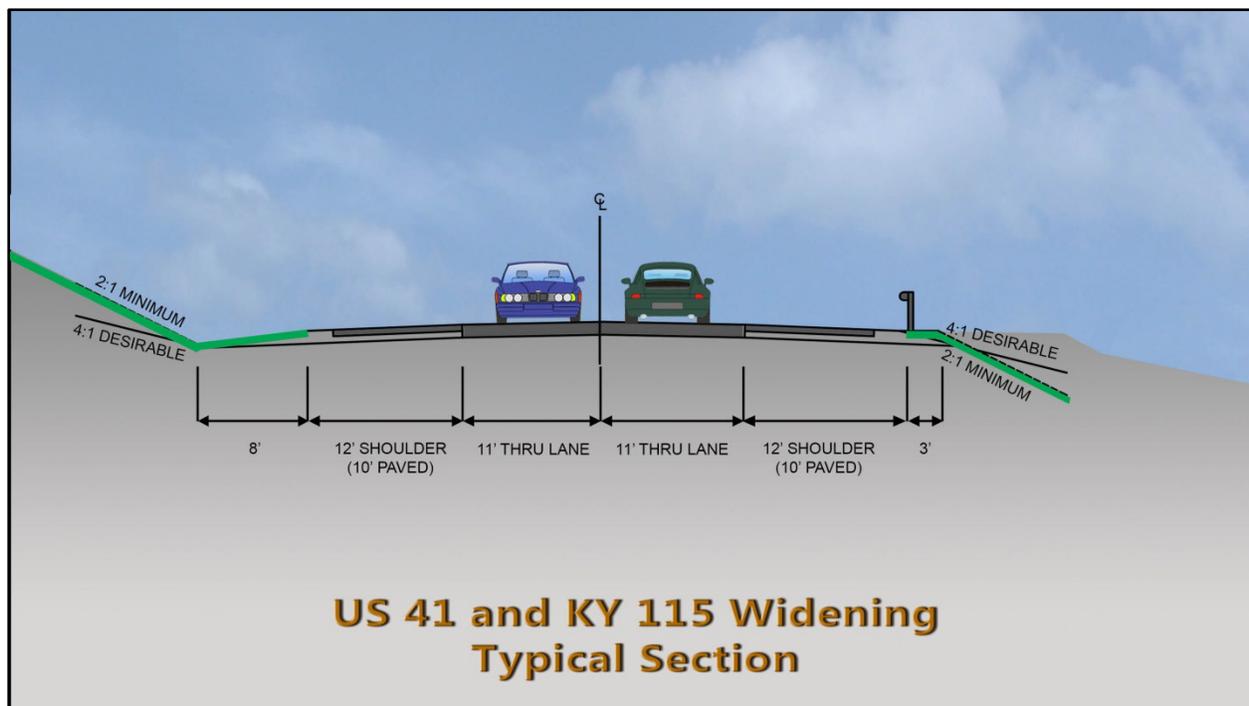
US 41 and KY 115 Widening Concepts A and C—Typical Section
